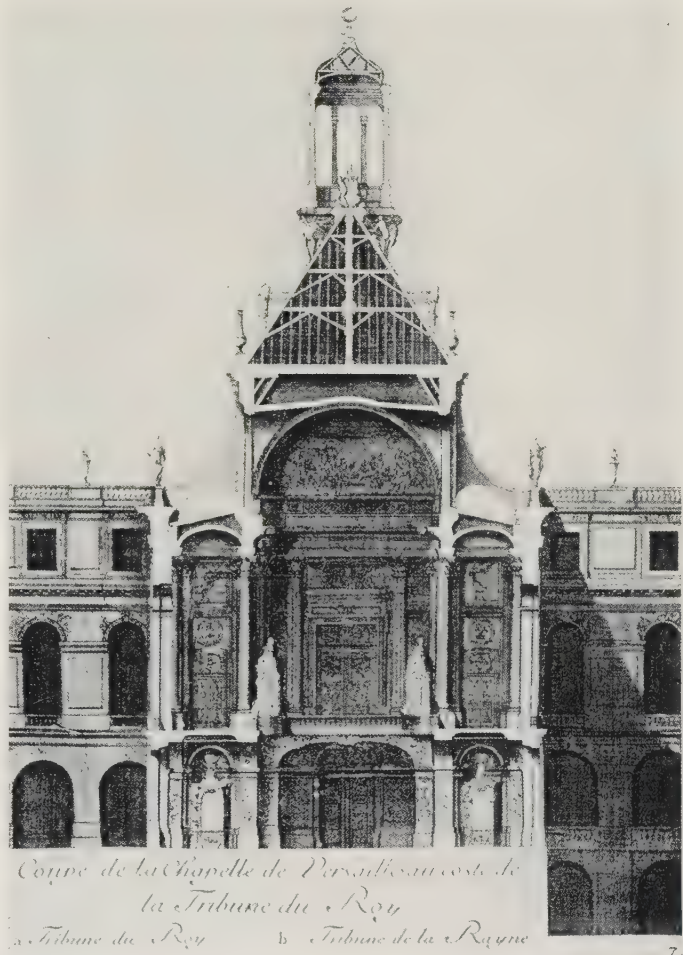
Section of the Chapel as built, 1699-1714, engraving by Pierre Lepautre, 1714.
